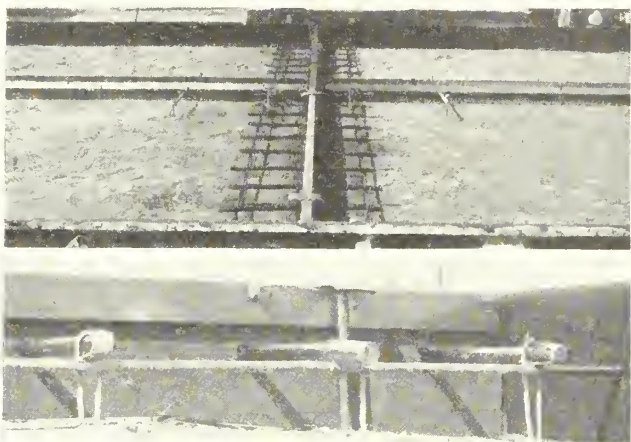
TYPE III JOINT IN PLACE ON THE SUBGRADE (UPPER), AND METHOD OF HOLDING DOWEL BARS IN PLACE (LOWER).
